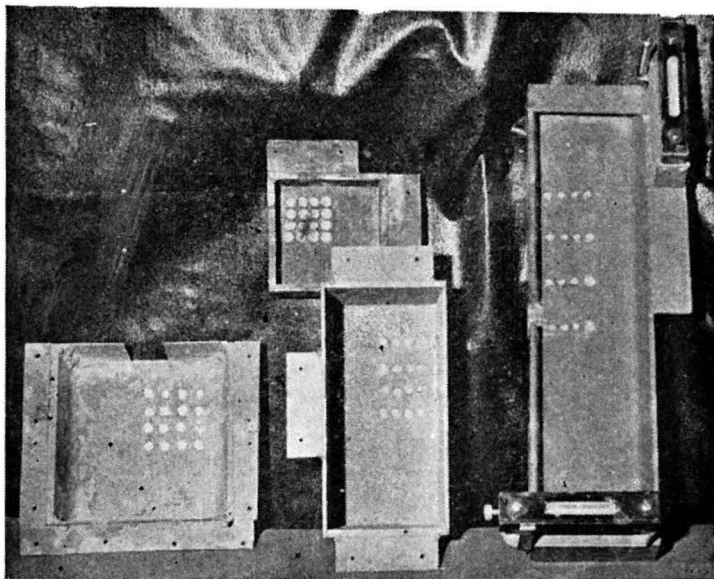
Footings and arrangement of tiltmeters on a footing
